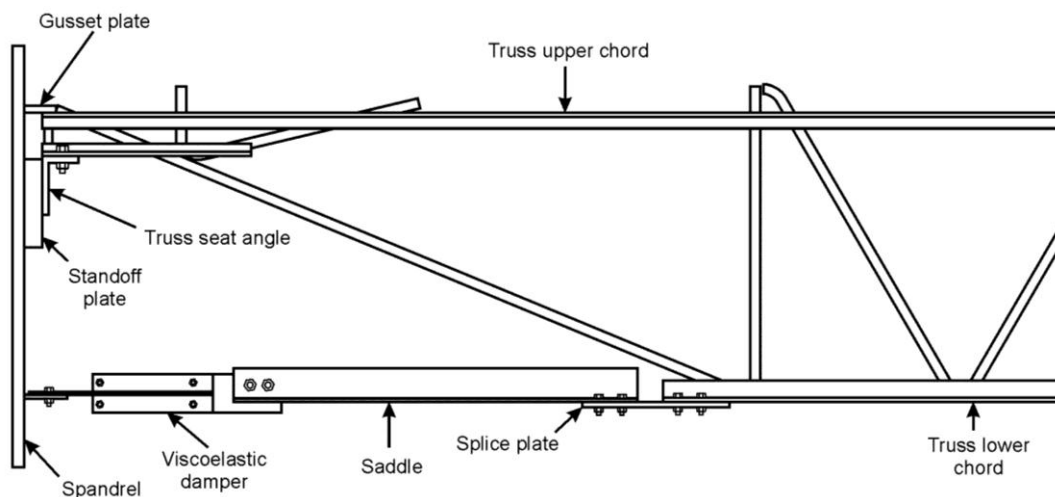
Diagram of floor truss showing viscoelastic damper [1].
